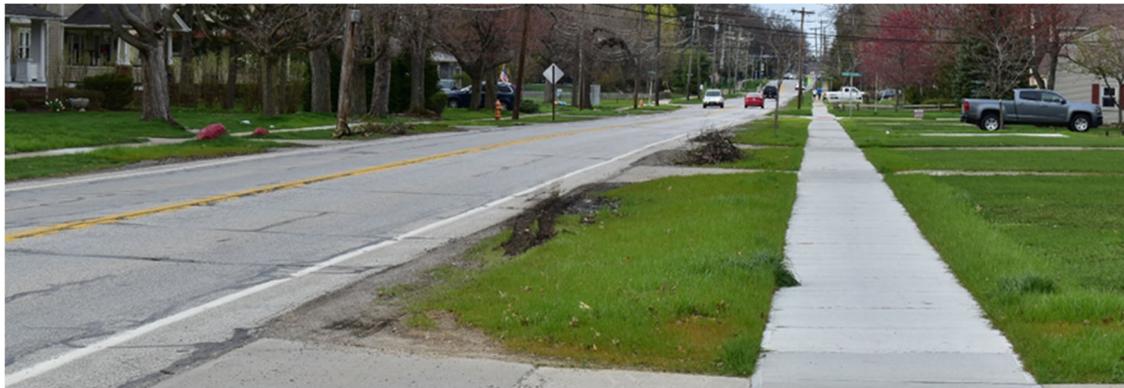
Clague Road Northbound Approaching Stoneybrook Drive
